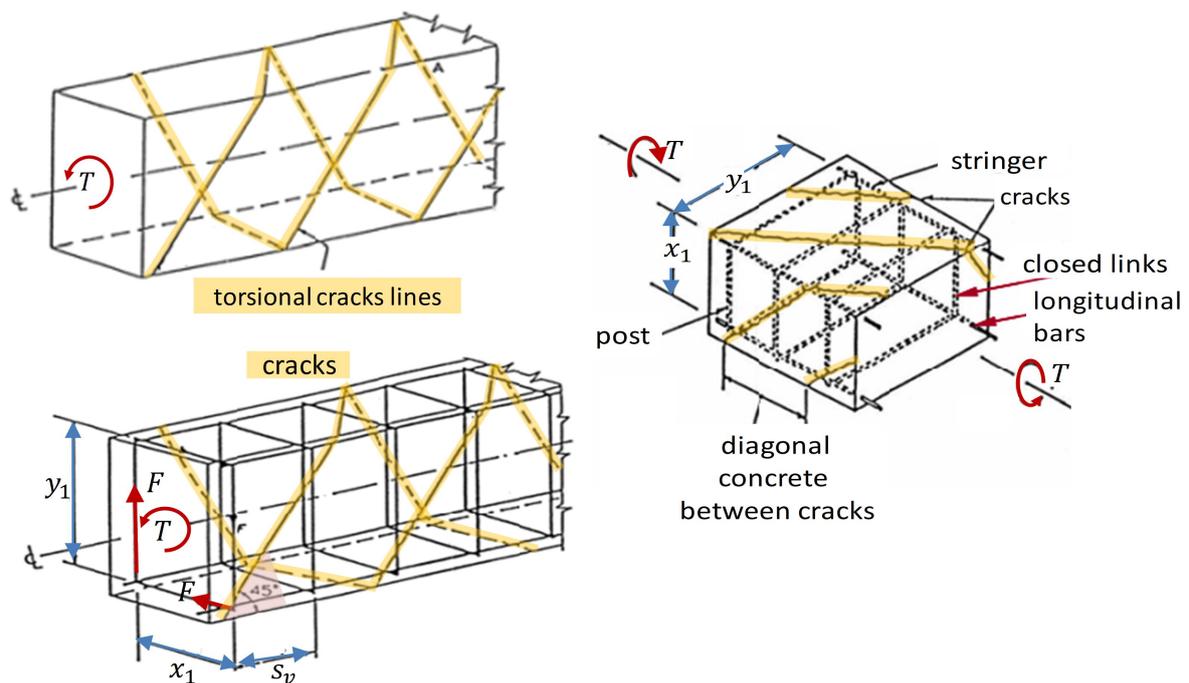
Diagonal cracking of plain concrete beam due to torsion. Space truss model used to design for torsion.
